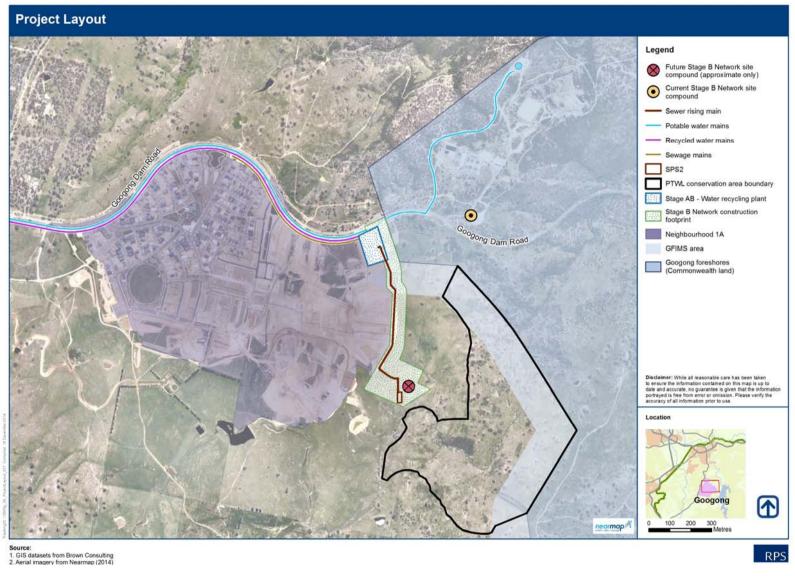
Site layout – Stage B Network and construction boundary [updated construction footprint]
